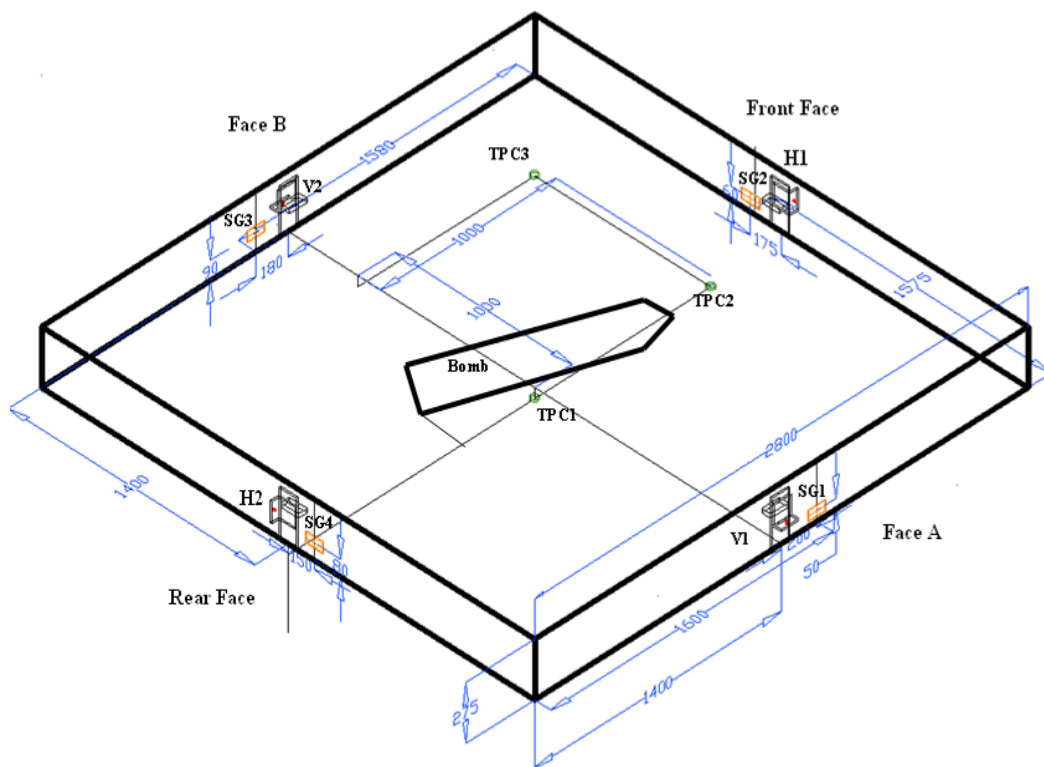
Instrumentation layout for Slab 2 (3D View)
